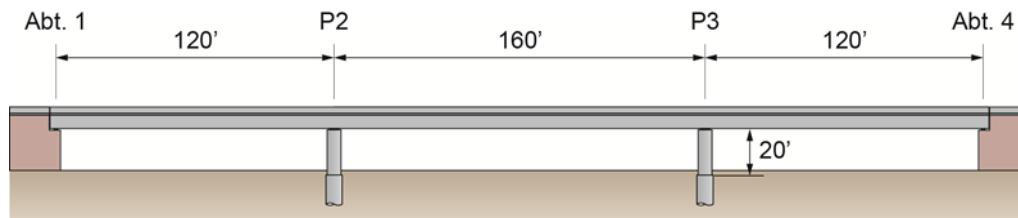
Example CIP Box Girder Bridge Elevation
